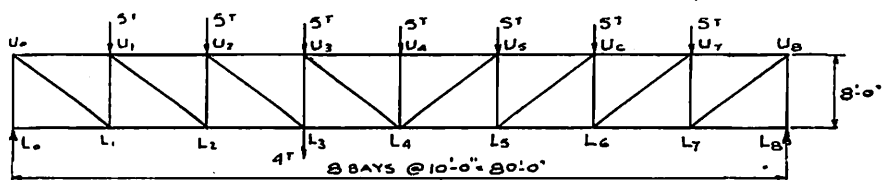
FIG B ROOF GIRDER WITH RUNWAY ON LOWER CHORD
